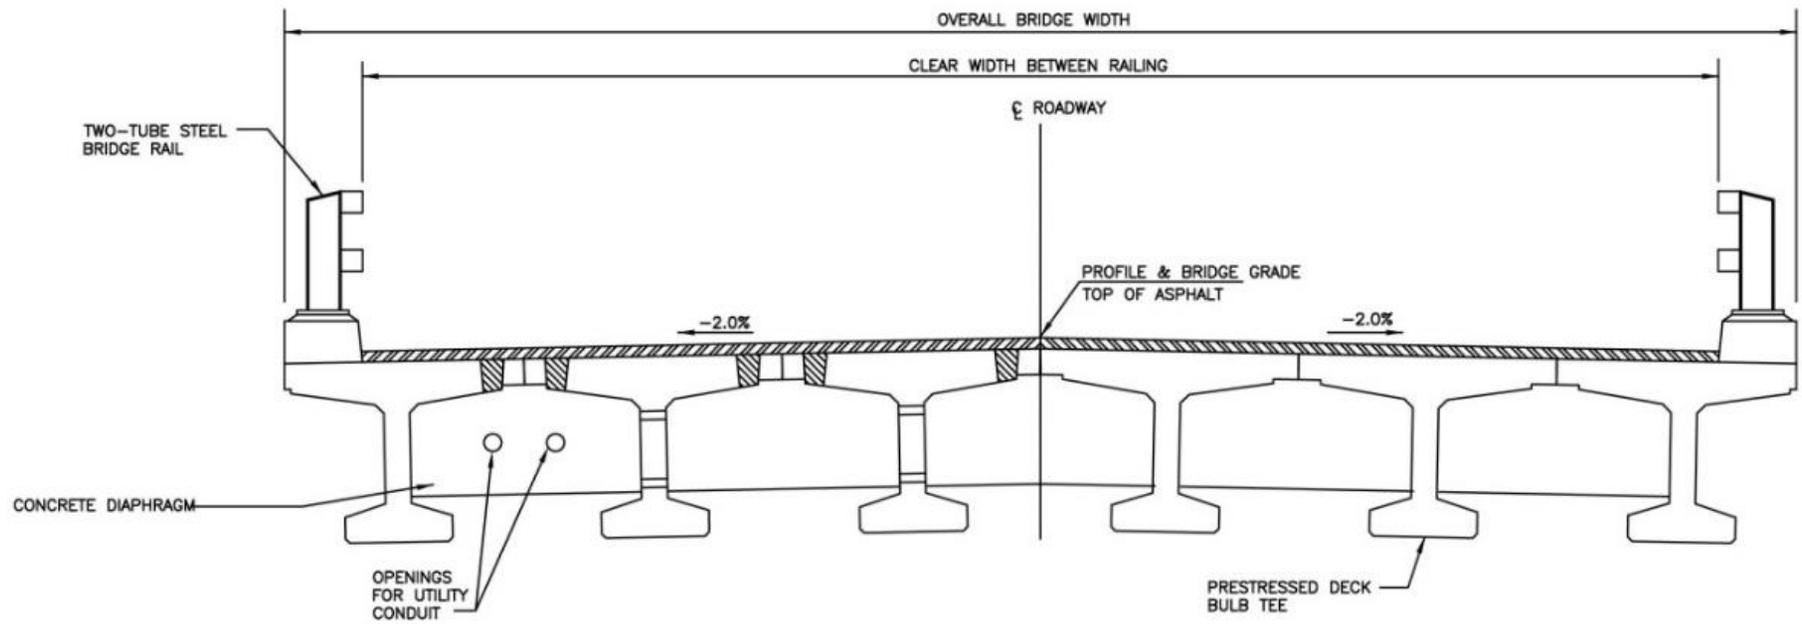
Section Drawing of a Typical Precast-Concrete Bulb-Tee Bridge
